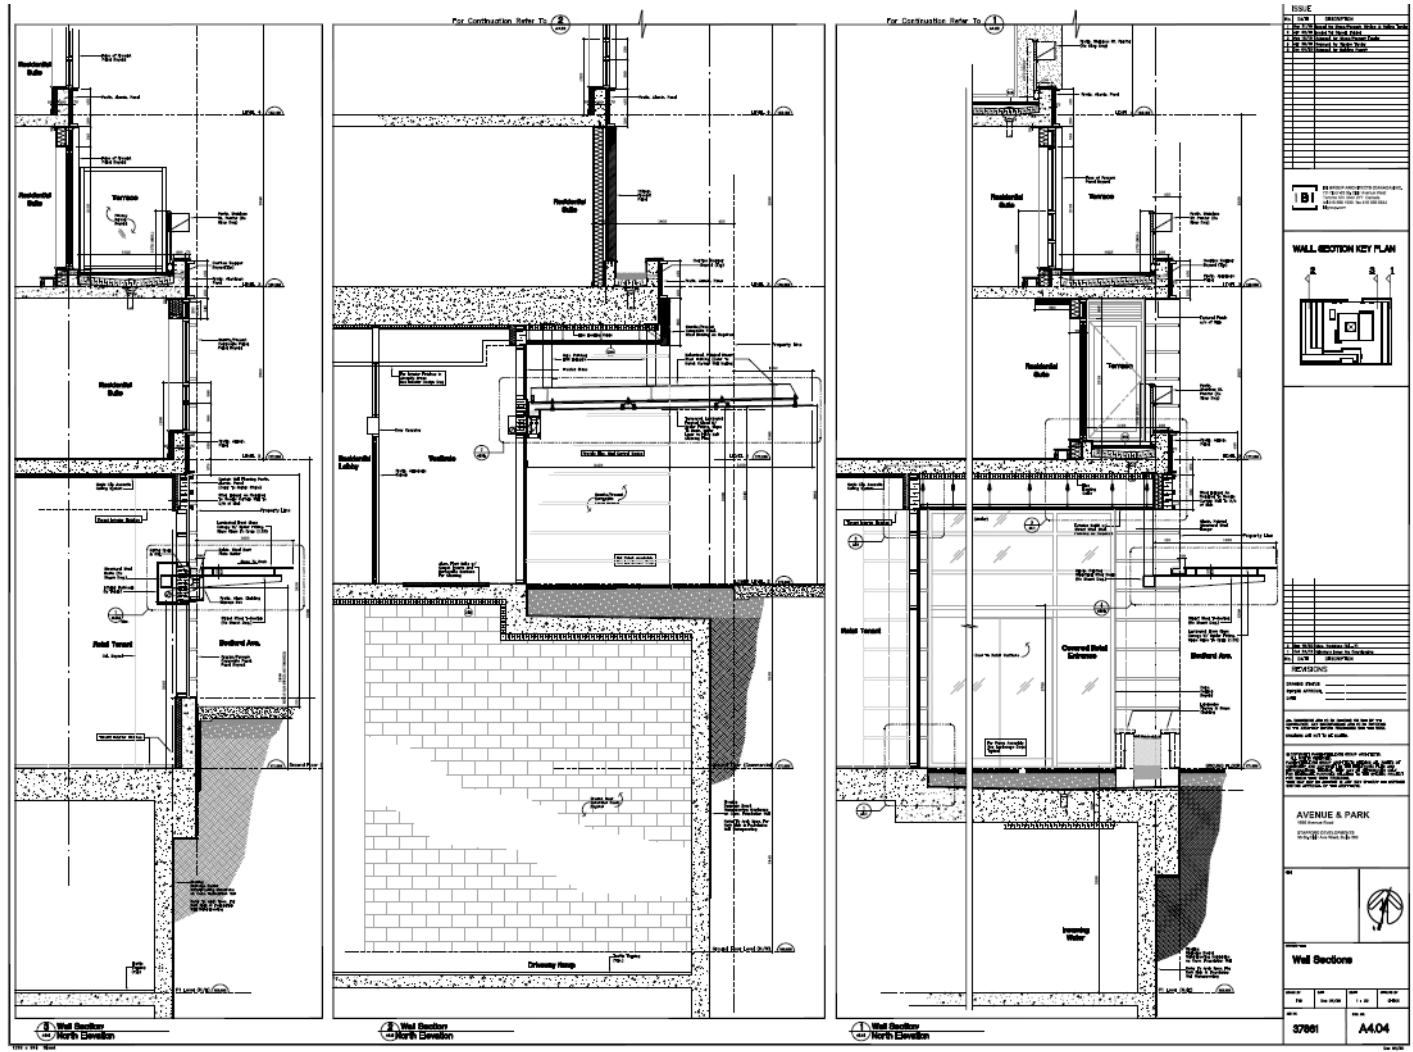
Wall Section 1 - North Elevations of retail/residential entrance canopy
